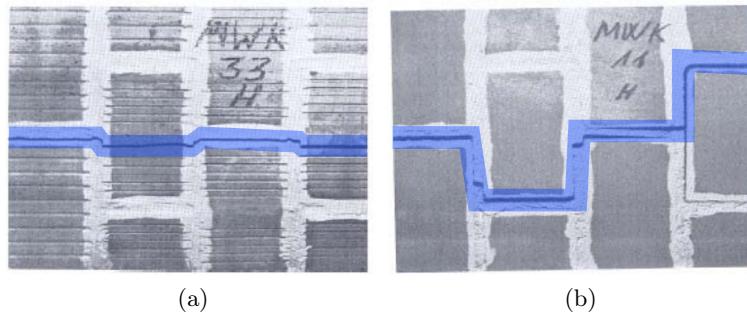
Failure modes of masonry walls under direct tension, from Backes (1985): through type (a), zigzag type (b).
